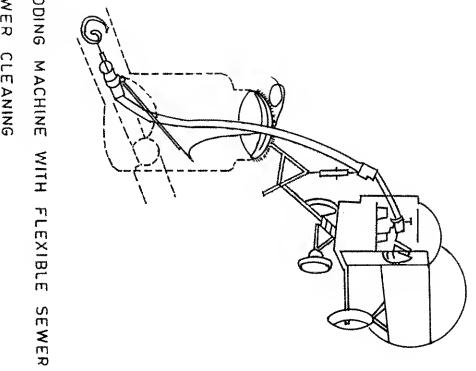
RODDING MACHINE WITH FLEXIBLE SE WER CLEANING SEWER RODS FOR
